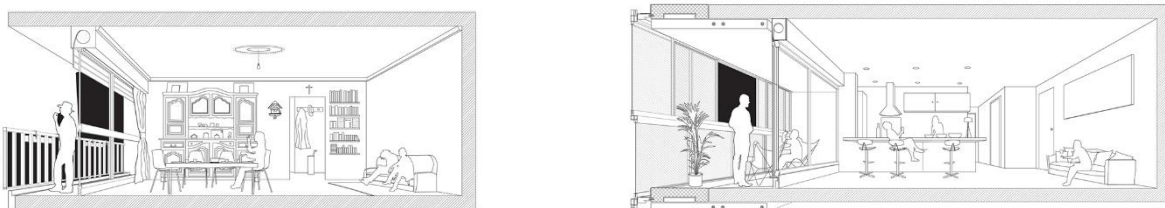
Section of typical flat before and after the façade renewal; (credit: LAN Architecture, www.lan-paris.com).
